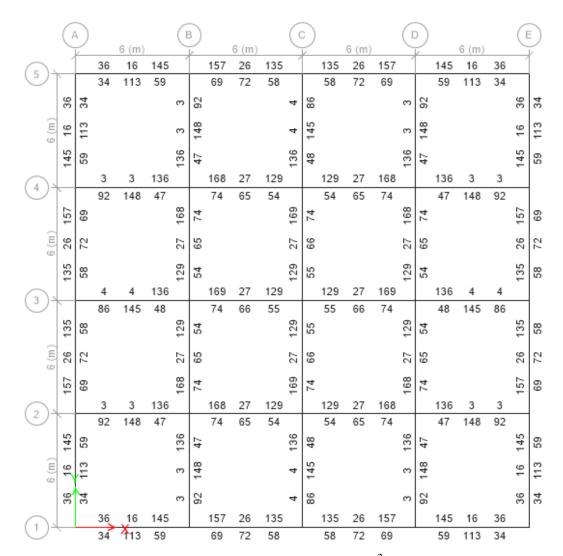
Beams reinforcements (mm<sup>2</sup>) for story 4
